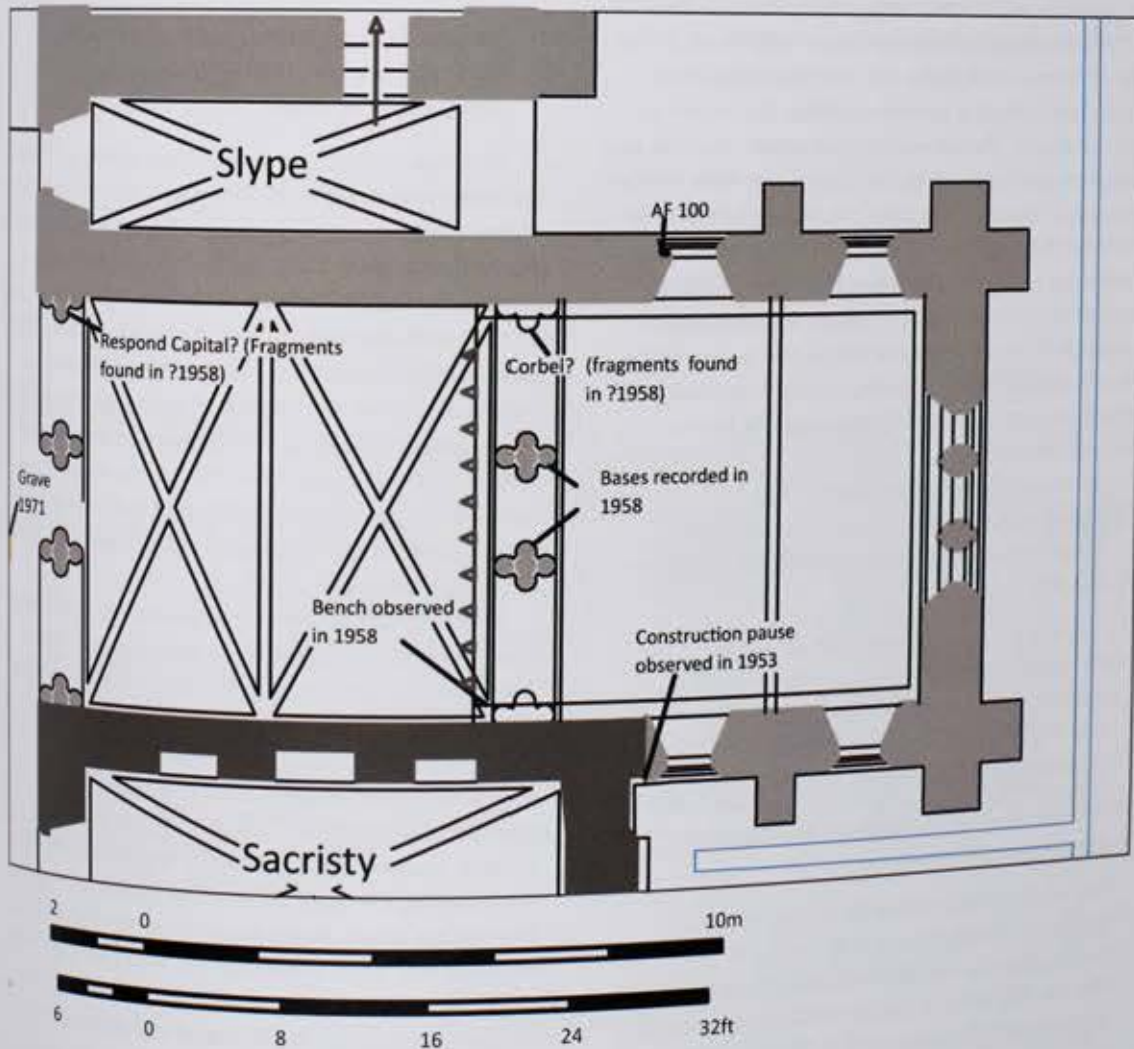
Conjectured reconstruction of chapter house vestibule ground plan showing vault and arcades
